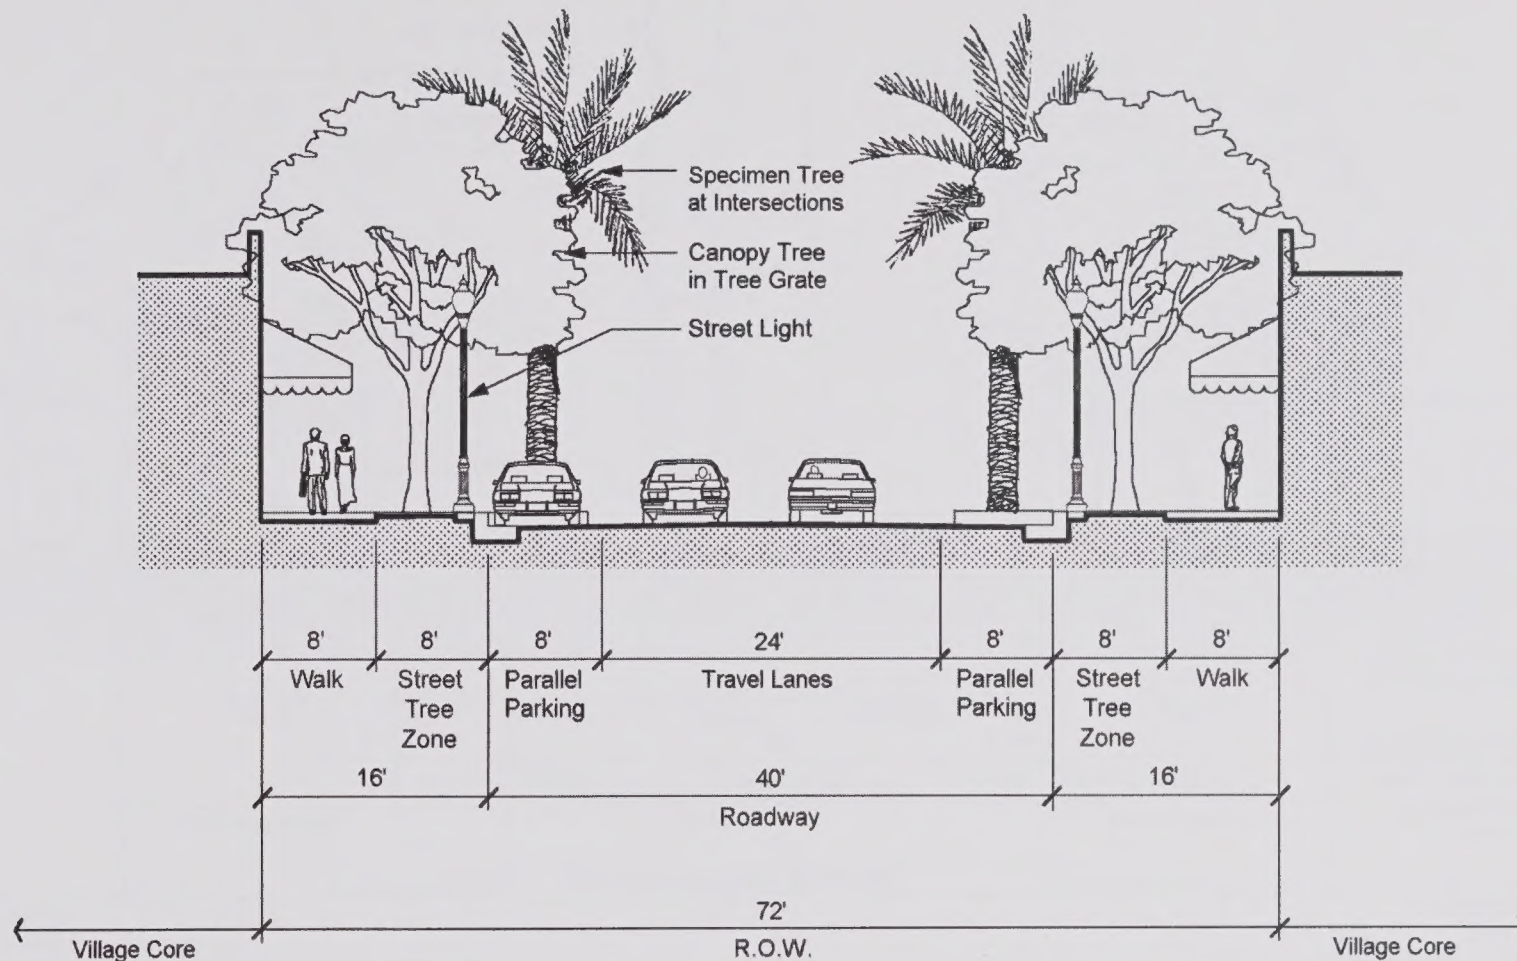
SECTION O – LAS COLINAS ROAD FROM HARTMAN ROAD TO RAYMOND ROAD
